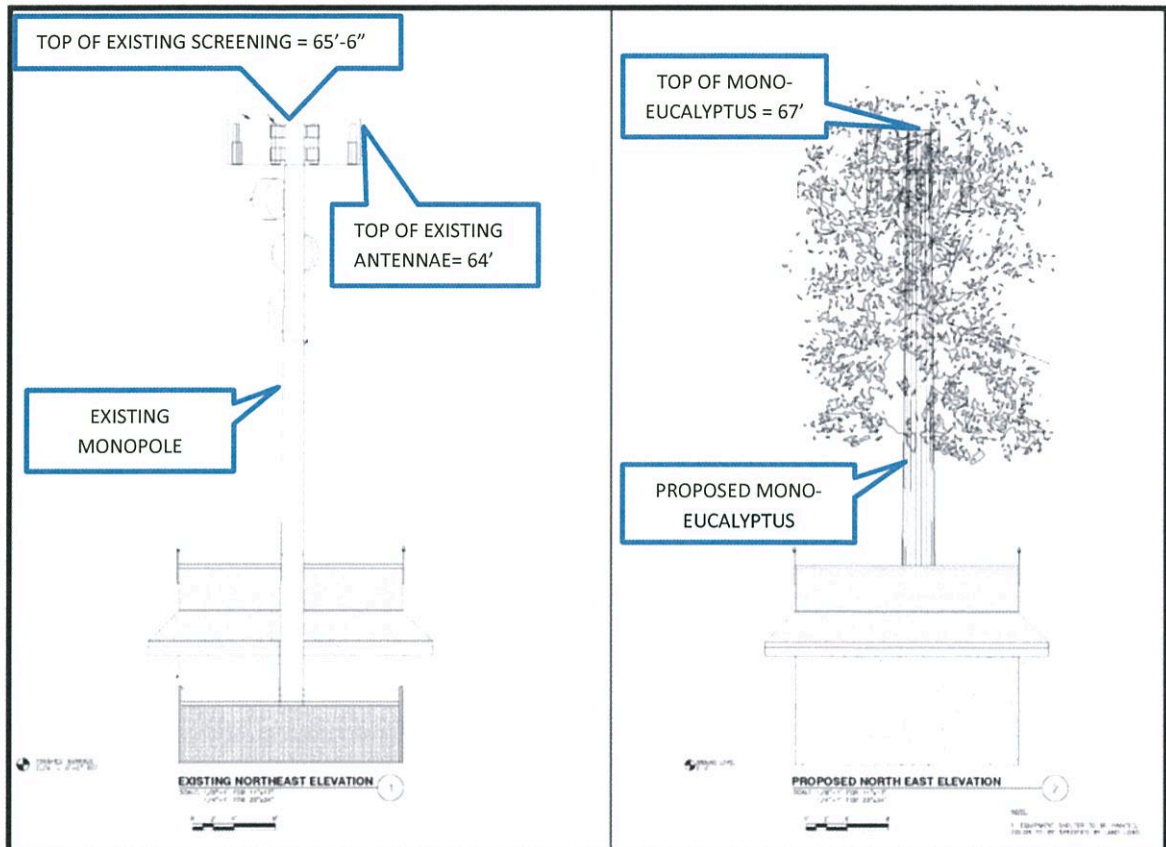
Elevation of existing site (left) and proposed facility (right) looking northeast on the property.
